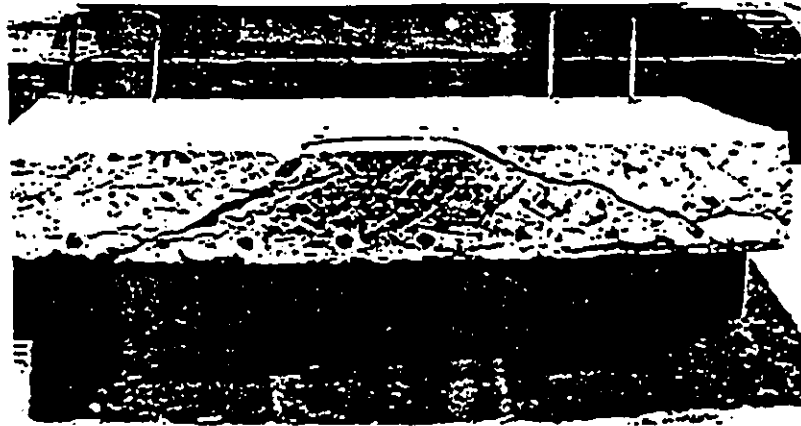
Cross-sectional view of slab C1 after failure
